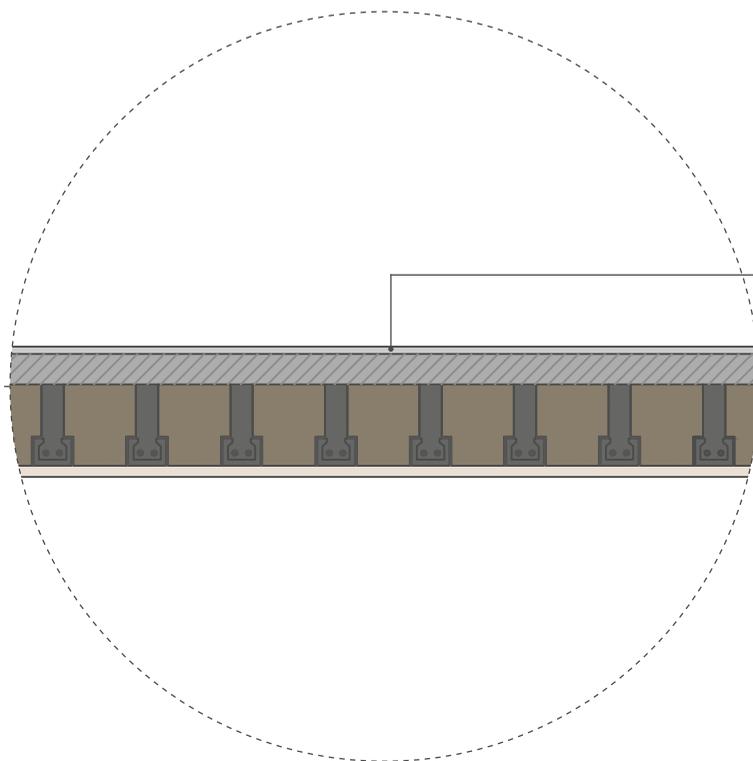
Detailed drawing of a wall and floor structure in the *Home* project
